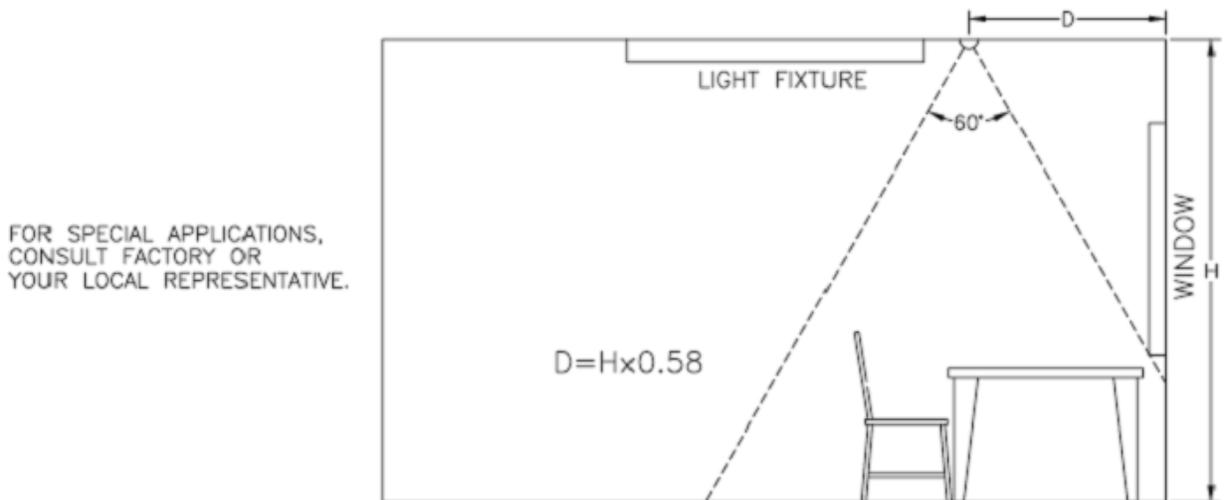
EDS SENSOR MOUNTING LOCATION
